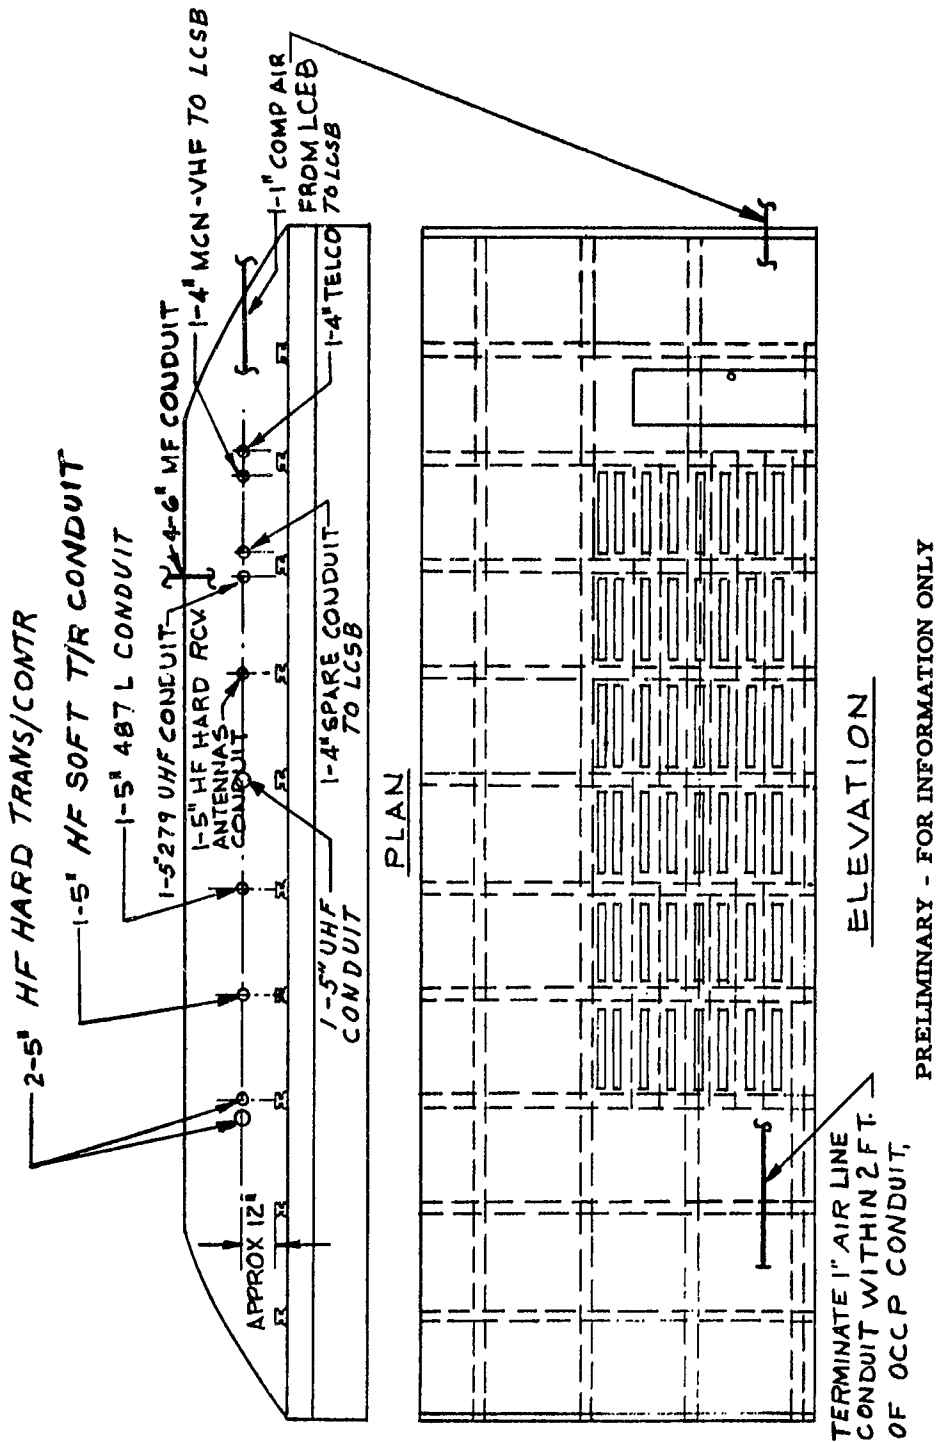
A. Plan and Elevation of EMP Room at LCC
